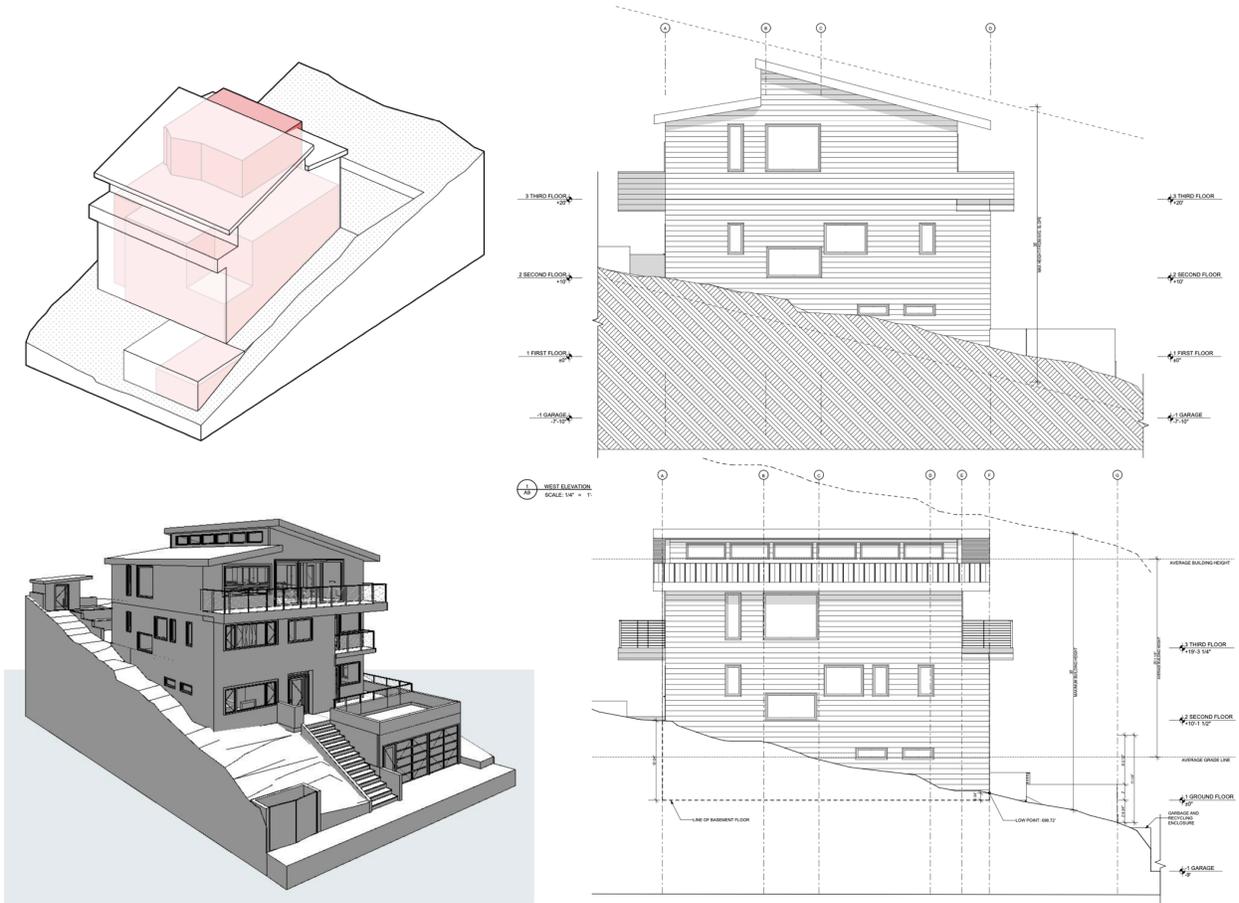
Recent changes in design. We have been sent two versions of the design. Top row: rendering and elevation from previous design sent to us in February 2022, with proposed balcony as opaque siding. Bottom row: rendering and elevation from latest design (uploaded January 3rd, 2023) with proposed balcony as wraparound glass. This change increases loss of privacy concerns.
